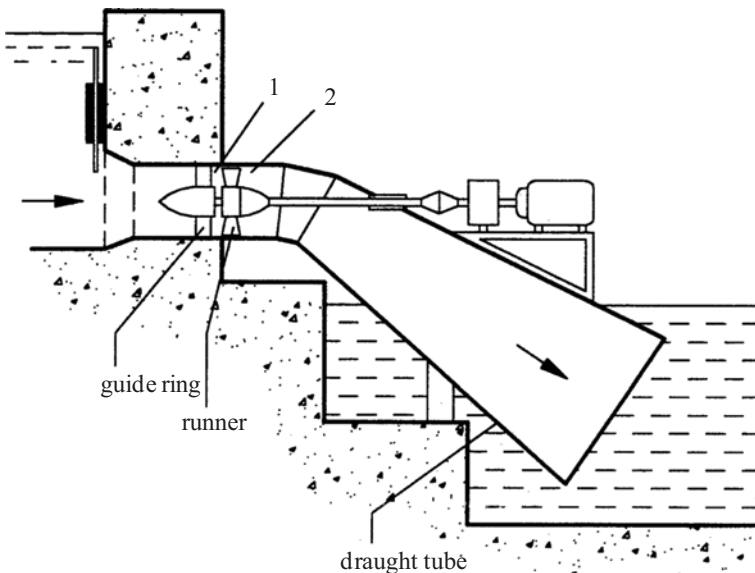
Longitudinal section of an axial hydraulic turbine
